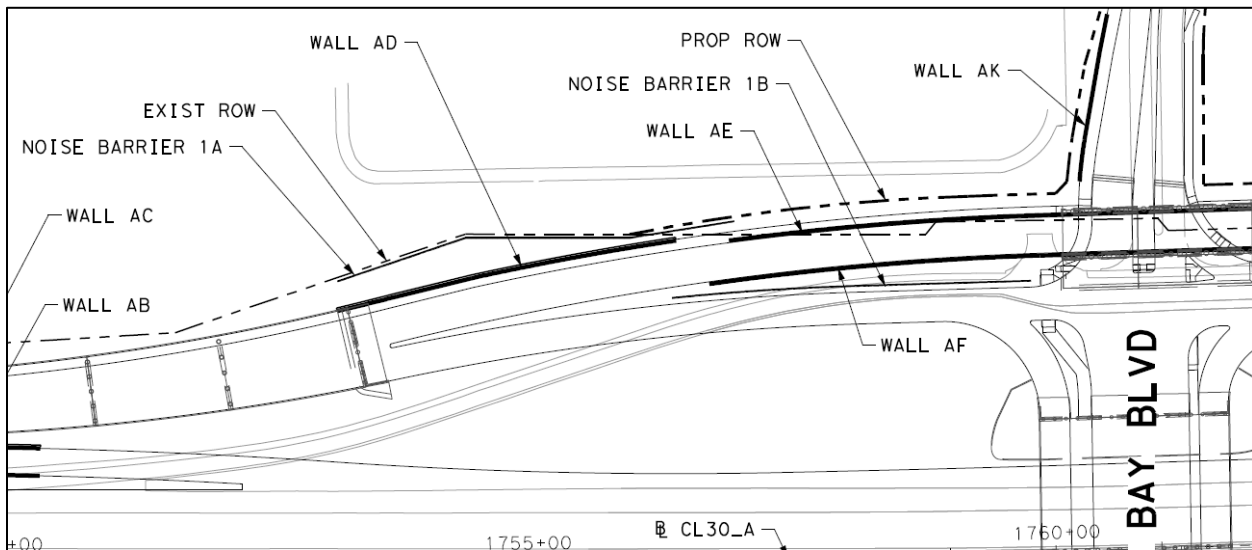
Location of Proposed Noise Wall 1A and 1B.
